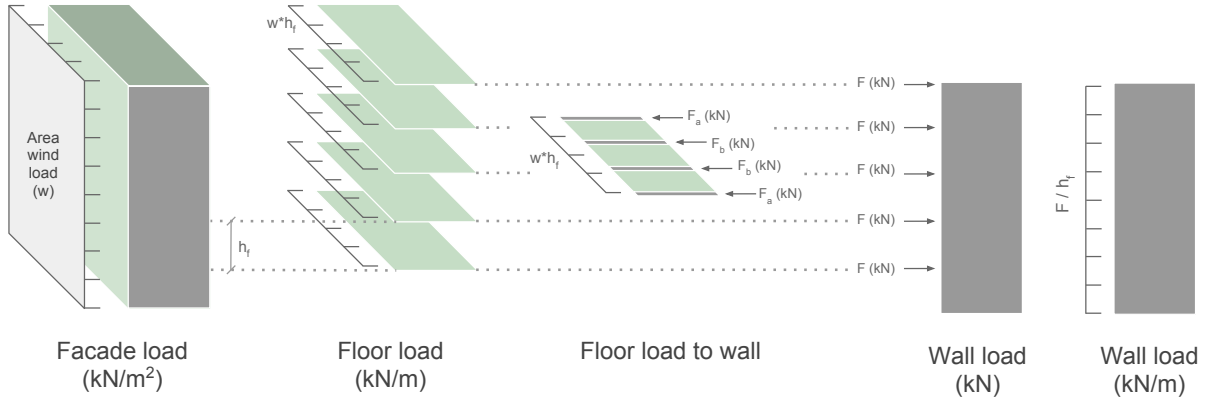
Transfer of lateral forces from the facade, to the floor and finally to the stability elements
